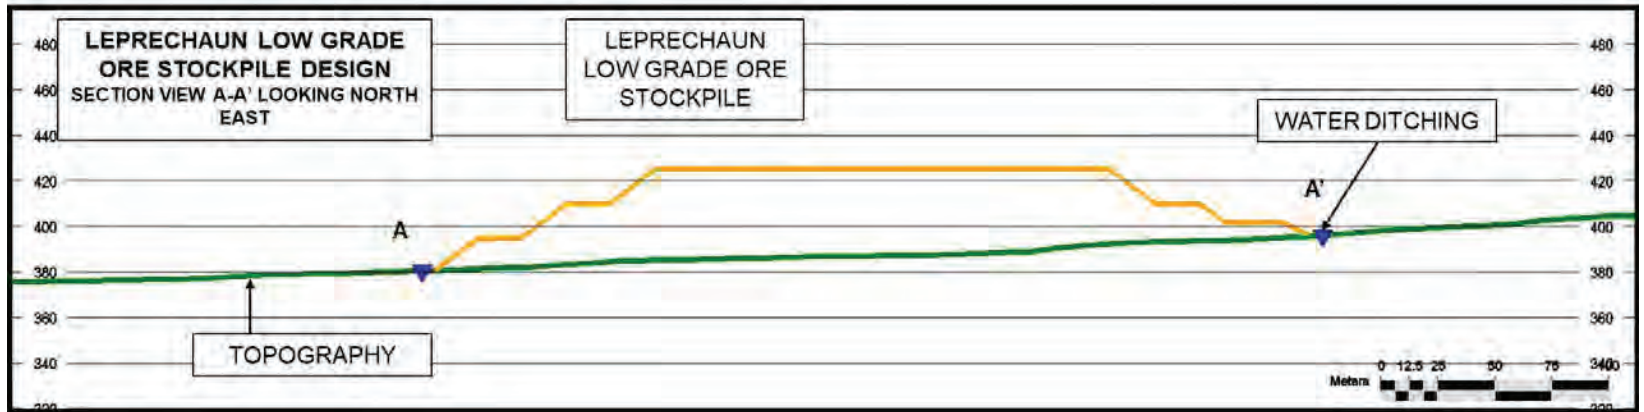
Leprechaun Low-grade Ore Stockpile Design – Section View A-A' Looking Northeast
